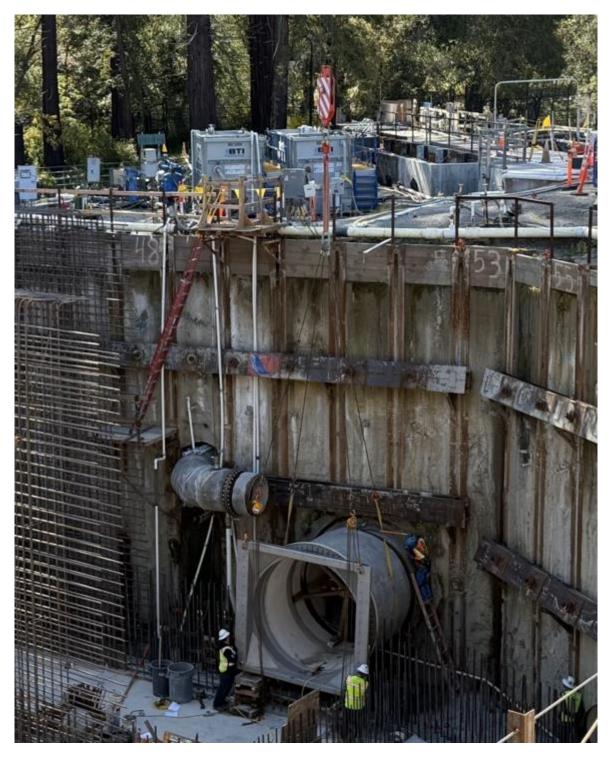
Welder on ladder connecting the 108-inch piping to the tunnel with the aid of pipefitters and the tower crane. This step completes nearly two years of complex underground construction to extend the Claremont Tunnel to the future UV-CCB Facility. The 36-inch wasteway piping which drains Lafayette Aqueduct No. 1 is located above the tunnel.
